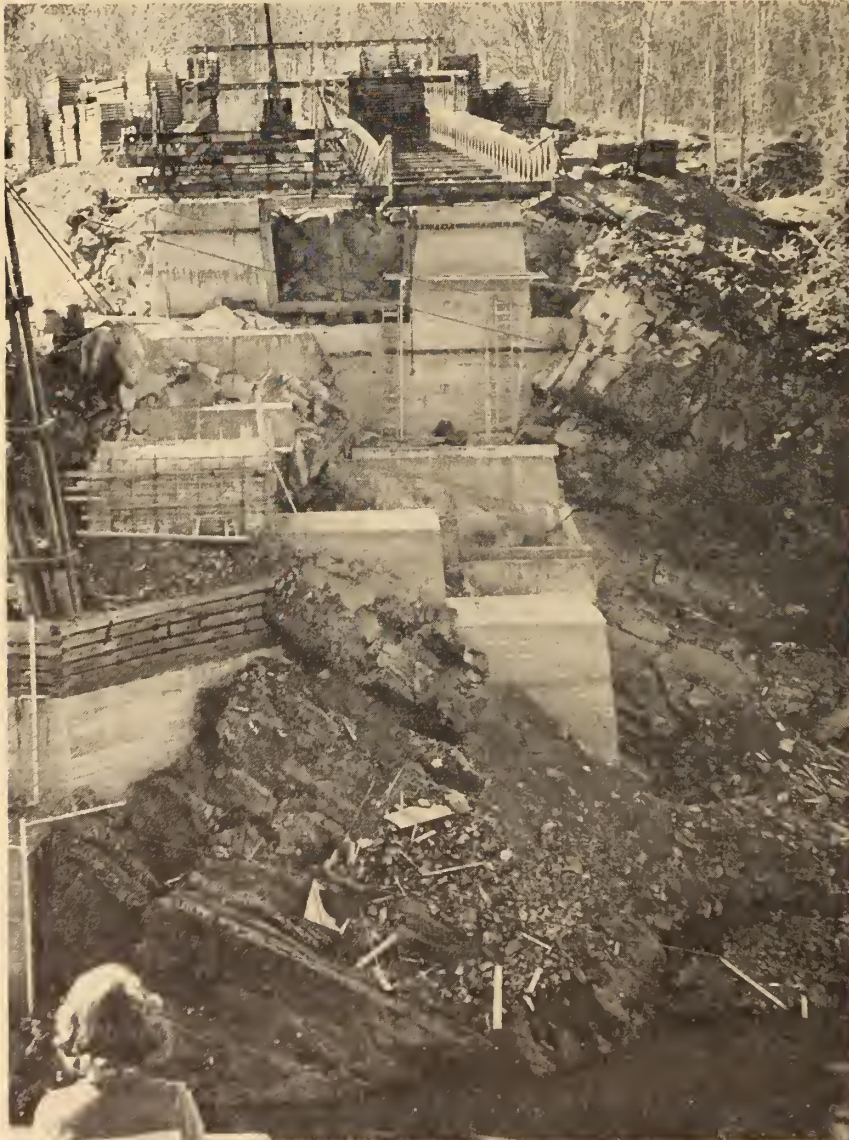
View of abutment showing construction of Bailey structure just after commencement.
